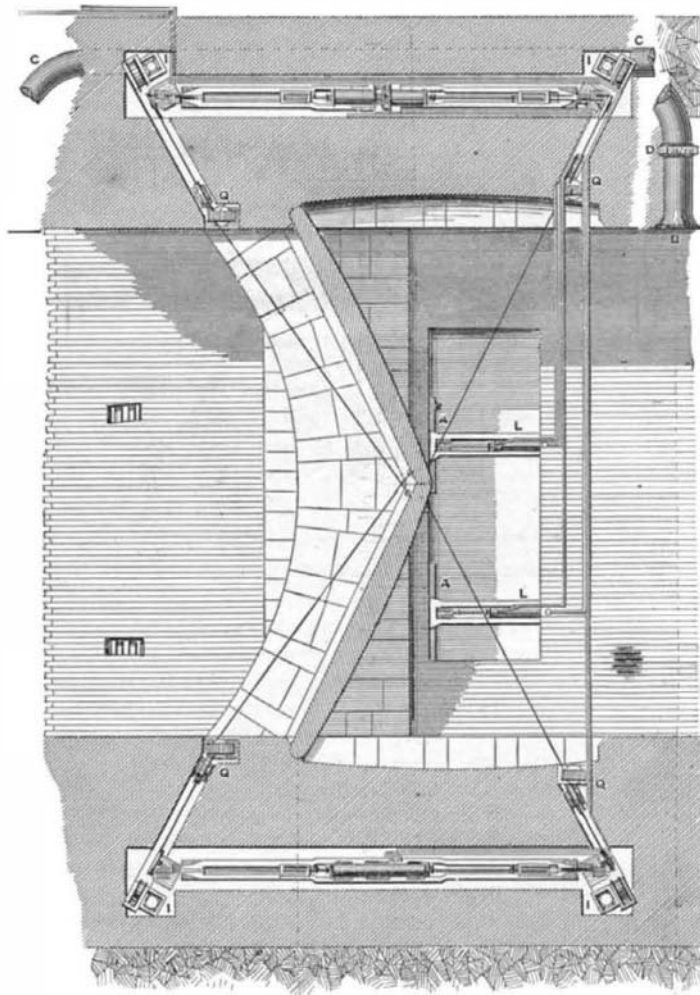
PLAN OF UPPER LOCK GATE SHOWING OPERATING MACHINERY.
